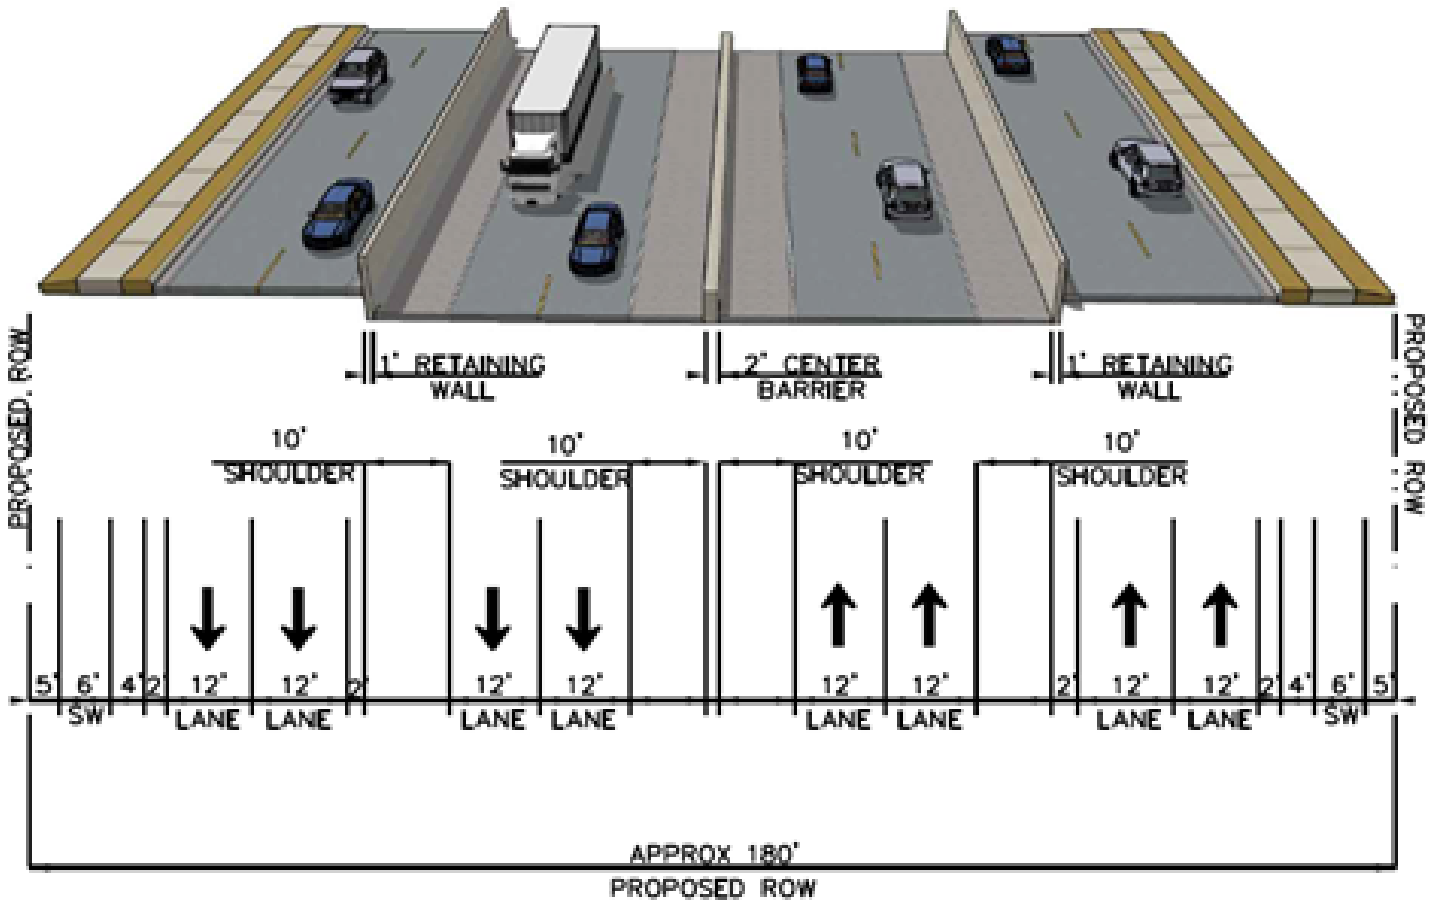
Proposed Nonrural Interstate Highway Typical Section (With Frontage Roads)
